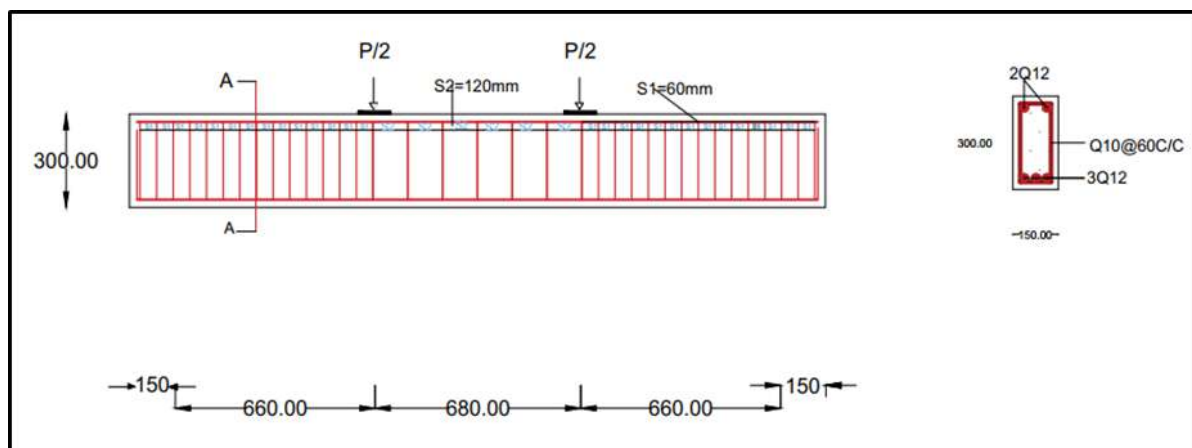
The Details of Reinforcement and Method of Loading for Concrete Beams
